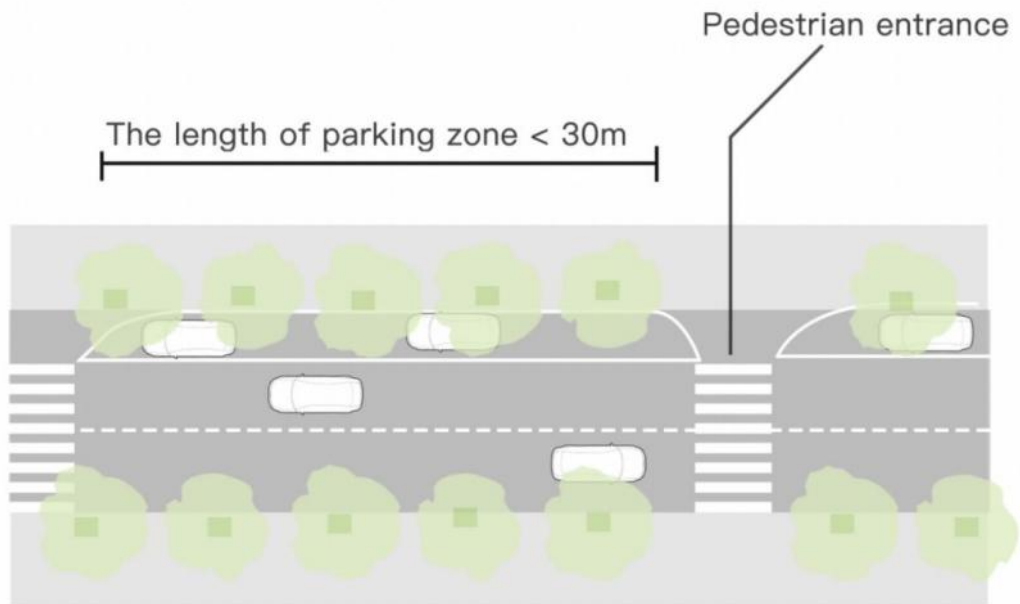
Parking zone width limit is not more than 30 m (Drawn by author)
